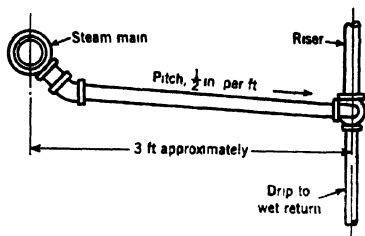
TYPICAL STEAM RUNOUT WHERE RISERS ARE DRIPPED
